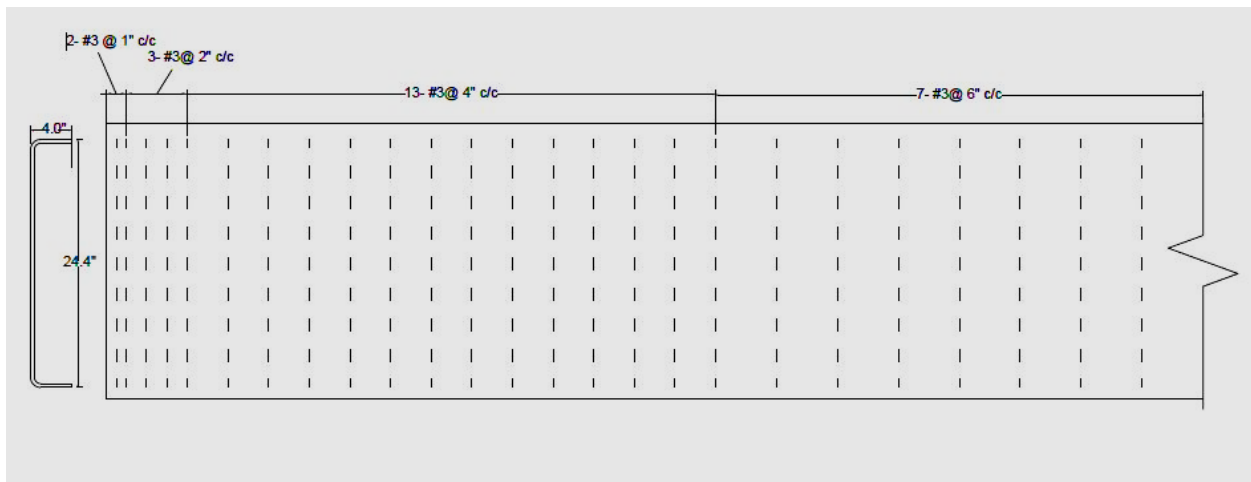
Stirrup spacing along the half length of the prestressed beam specimens
